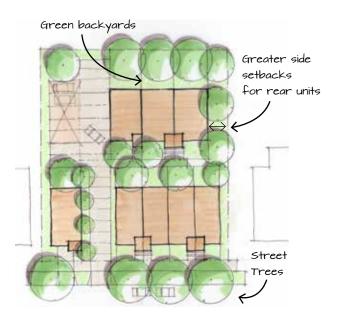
Illustrative example of townhouses with clustered parking on consolidated lots. Separating parking from units can improve the relationship of units to open space and reduce the amount of the site designed around car movement.
